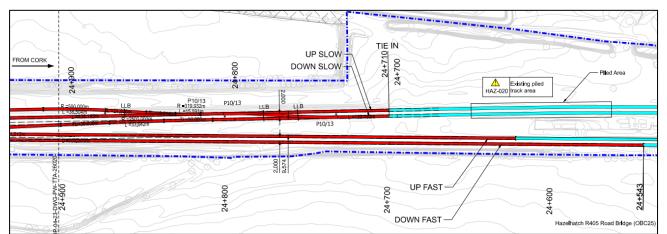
Hazelhatch & Celbridge Station – Track Plan Layout (2 of 3)
